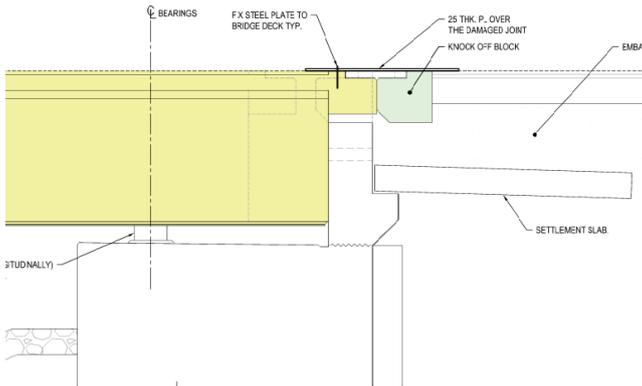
Temporary Repairs at the Leading End of Bridge Following a Design Level Earthquake
